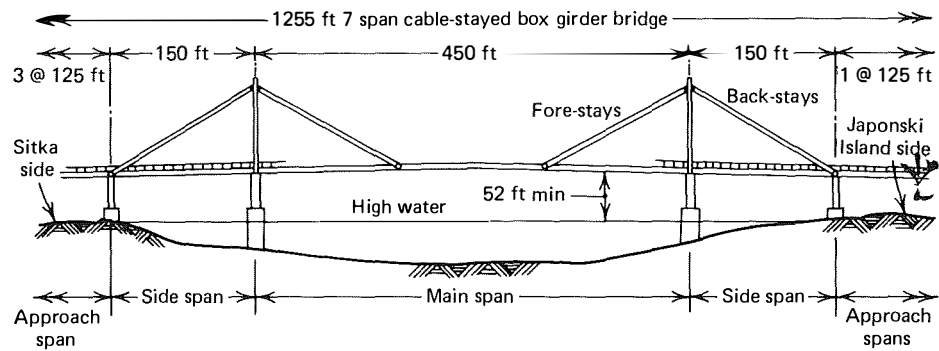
Sitka Harbor Bridge, elevation. (Courtesy of Civil Engineering-ASCE, from reference 1.)
